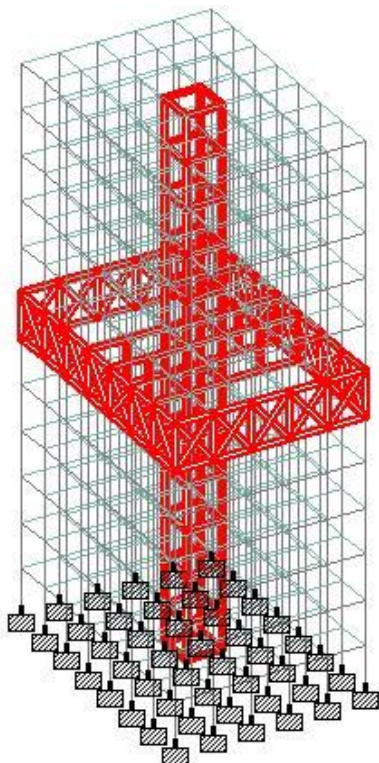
3D view of case (RA5) Residential Apartment with Shear core outrigger and truss belt supported system
